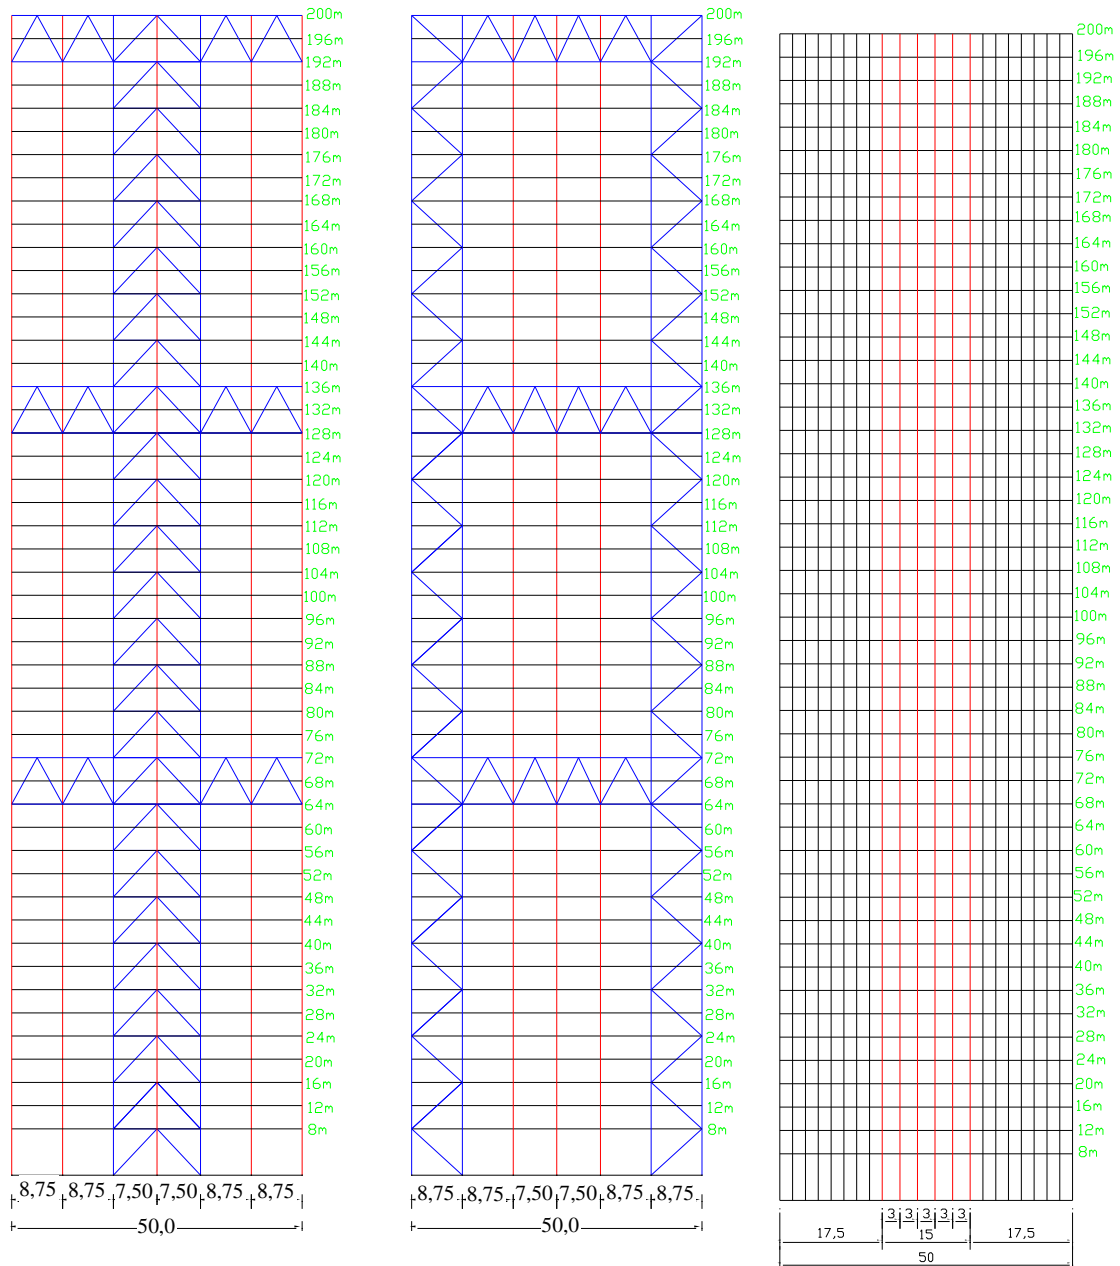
Elevations in x, y directions for OB system and front elevation for FT system.
